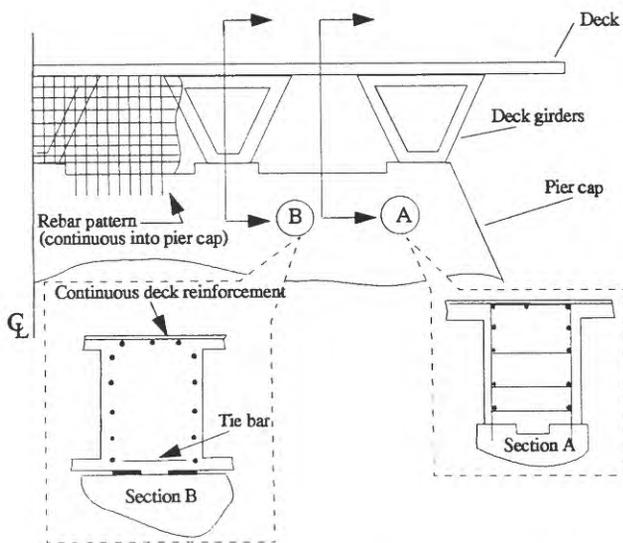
Superstructure to pier fixed connection (courtesy of Lawrence Livermore National Laboratory).
